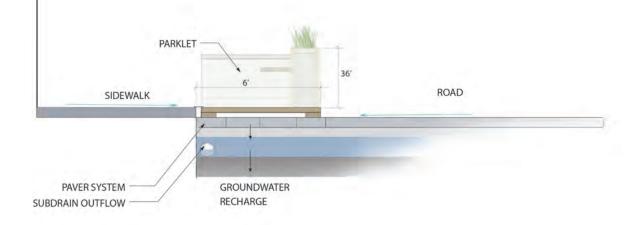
Permeable Paver + Parklet Stormwater
